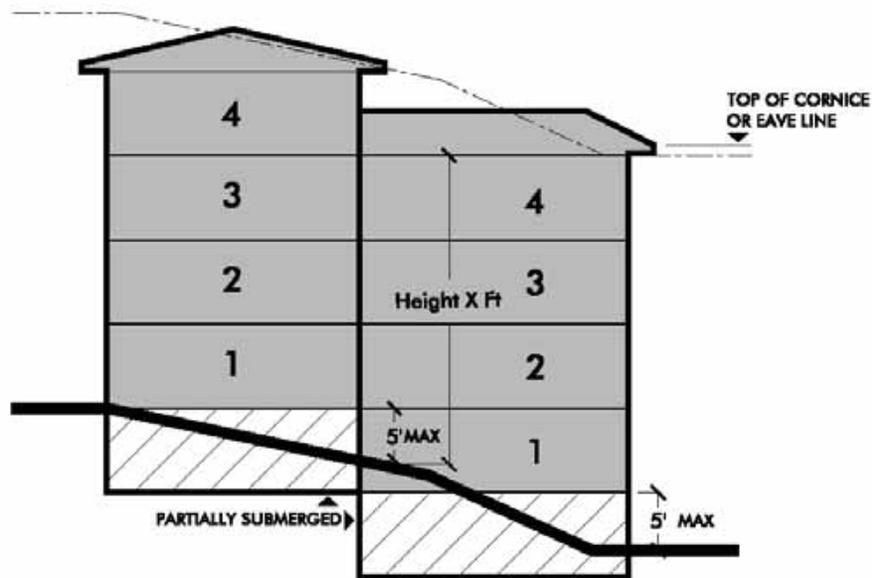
2.64.202 BUILDING HEIGHT - SLOPED SITE
